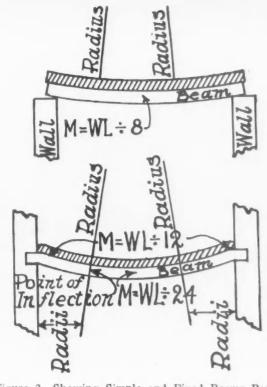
Showing Simple and Fixed Beams Bent Under Load.
